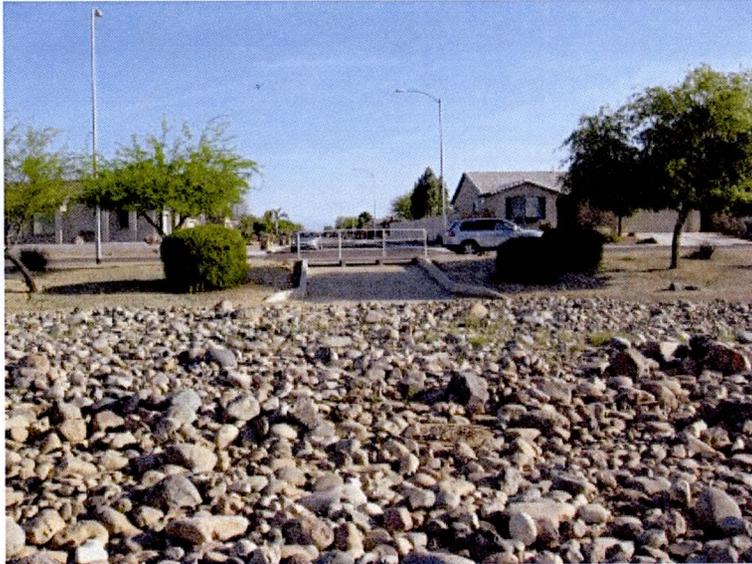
Facing north, southeast corner of the intersection at N. 111th Ave. and W. Cimarron Blvd.
